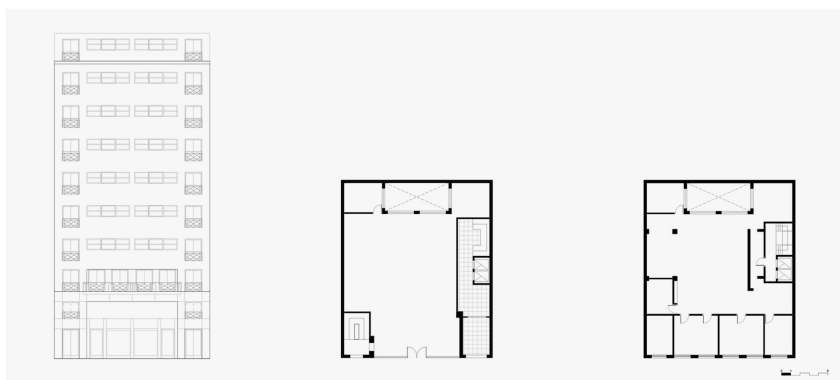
Lavalle 526, Buenos Aires (redrawn from original plans by the author)
